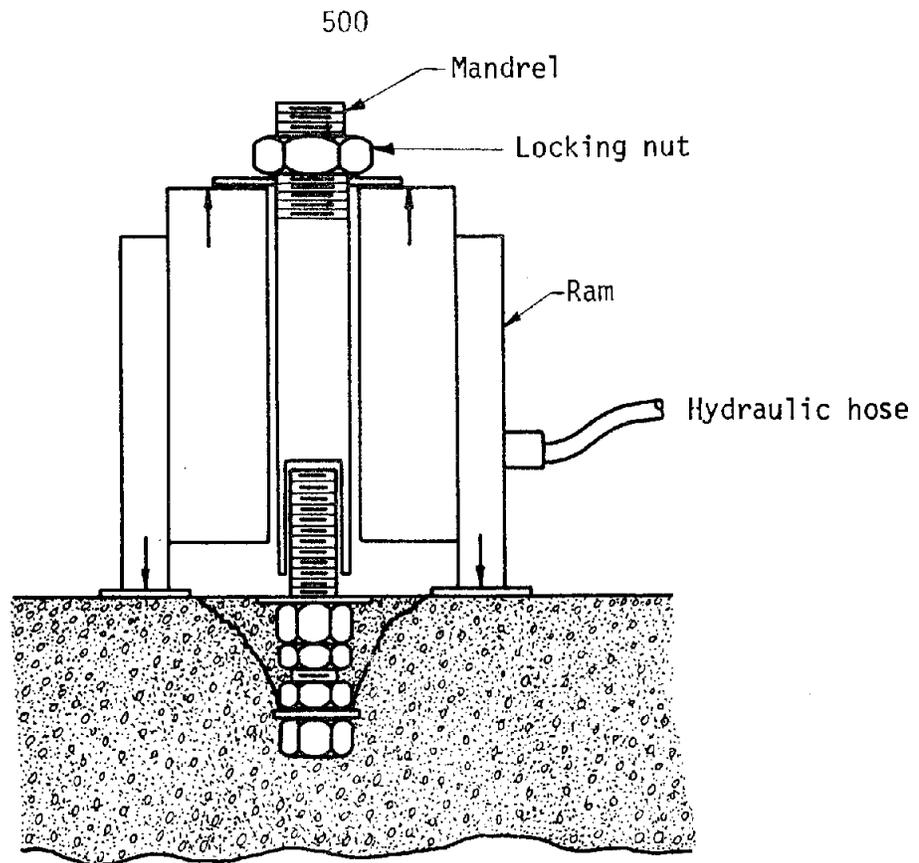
SKETCH OF CENTER-HOLE JACK ATTACHED TO ANCHOR
